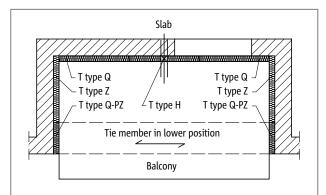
Schöck Isokorb® T type Q, Q-PZ: Recessed balcony supported on three sides - symmetric with tie member
